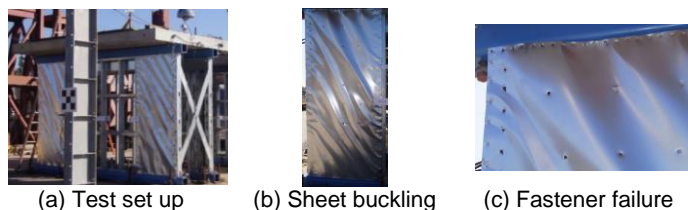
CFS-framed steel sheet sheathed shear wall line test by Singh et. al. [2][3]
